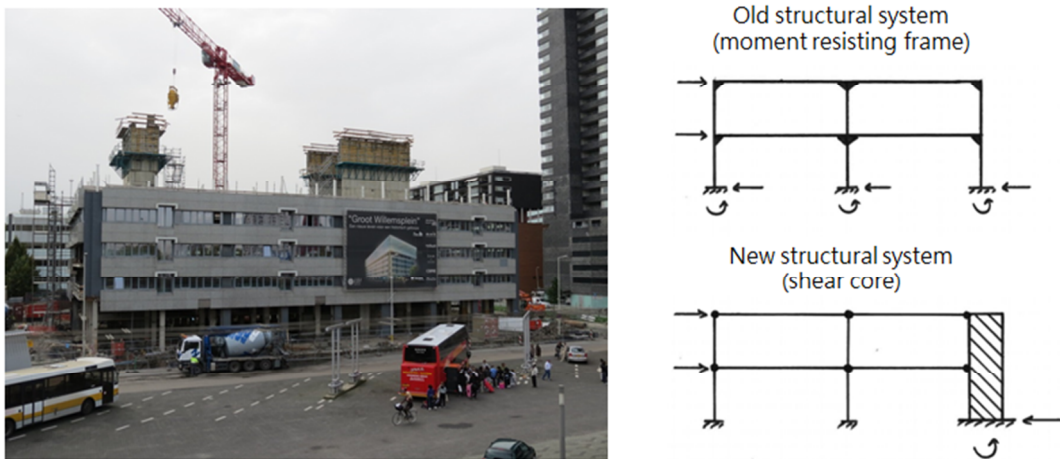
Groot Willemsplein - (Left) Construction of the new stability cores (Right) Schematic representation of the new and old structural systems
